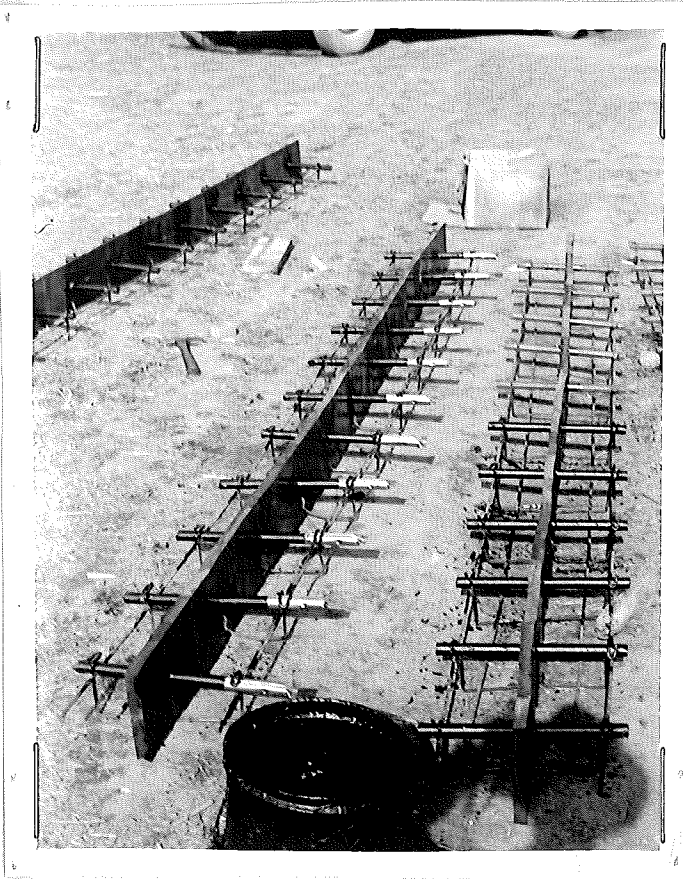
View of compressed and treated red-wood expansion and contraction joint assemblies set up for dowel lubrication and sleeve installation.
